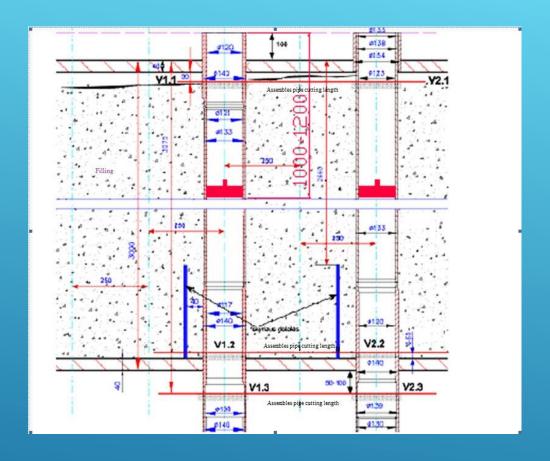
Blind flange insertion places in V1 and V2 pipes during cutting works in V1.1 / V2.1
